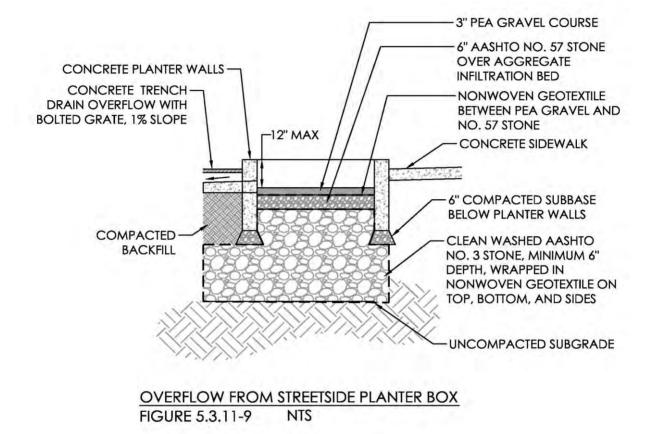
Example of the overflow (exit) from a streetside planter box (cross-section C-C'). In this application, a gravel connection to the underlying stone bed is provided.
